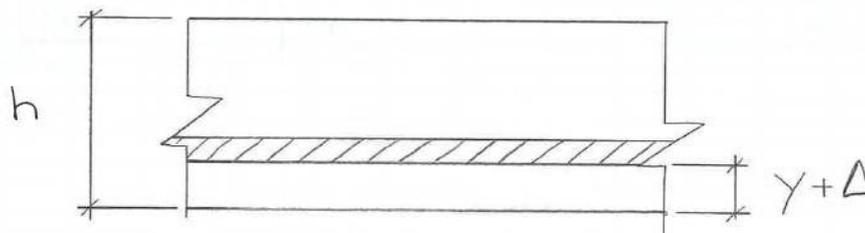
Location of Reinforcement and Ducts in Pre-stressed Elements
